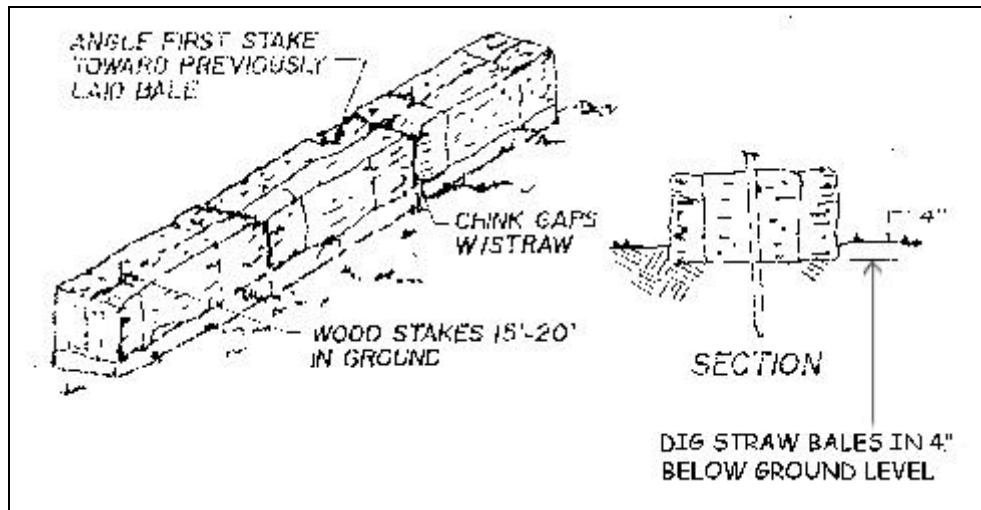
Detail of straw bale filter installation (Source: CBBEL files)
